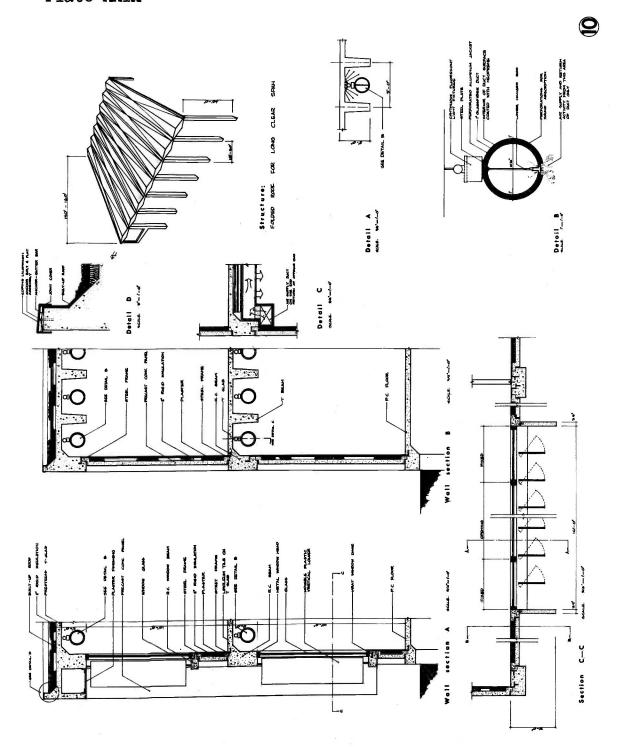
Plate XXIX illustrates the typical wall sections, and detail of lighting and air conditioning layout of secondary school.
